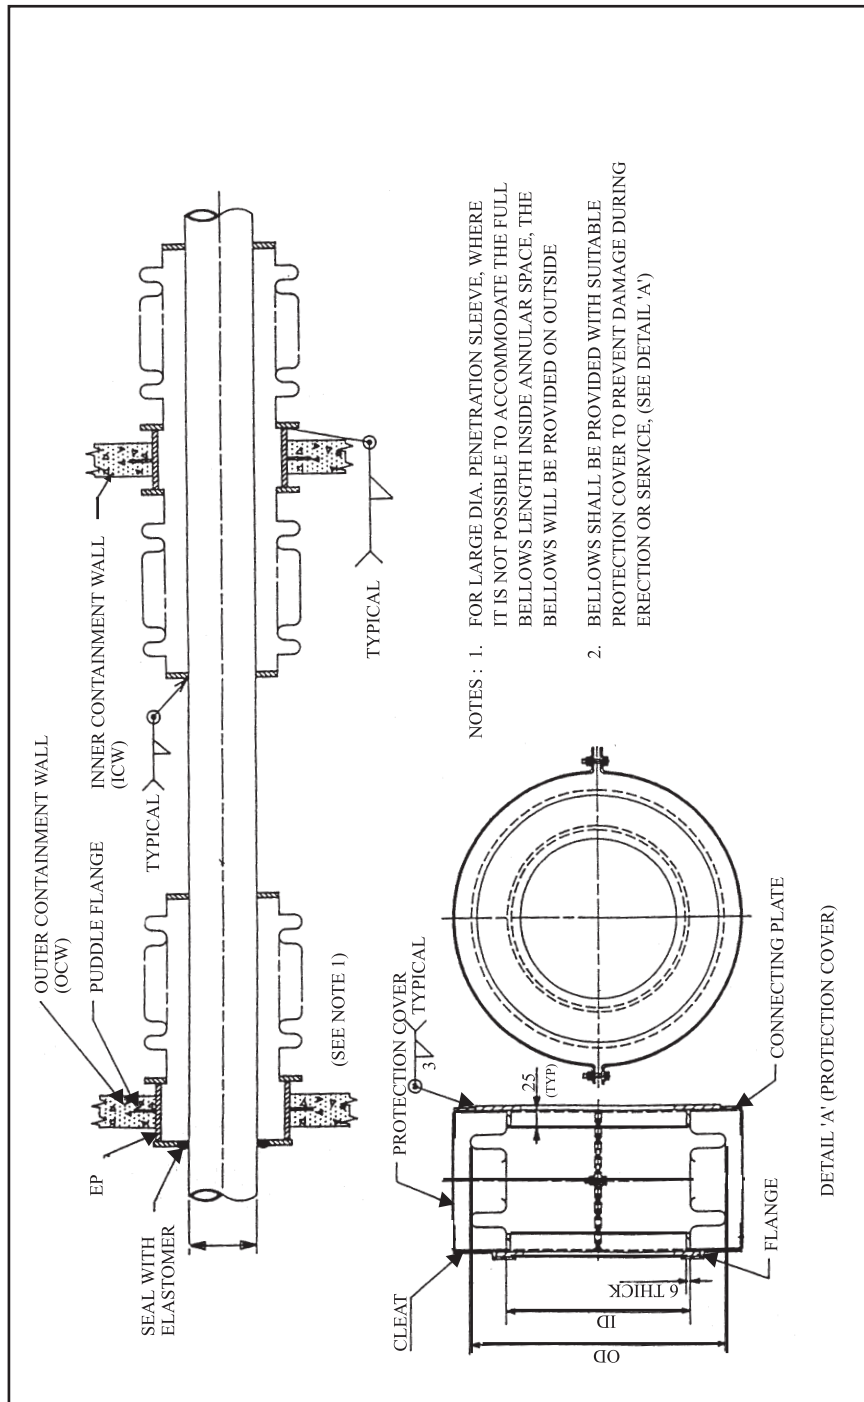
TYPICAL DETAILS OF PENETRATION ASSEMBLY WITH EXPANSION BELLOWS IN ICW AND OCW.
